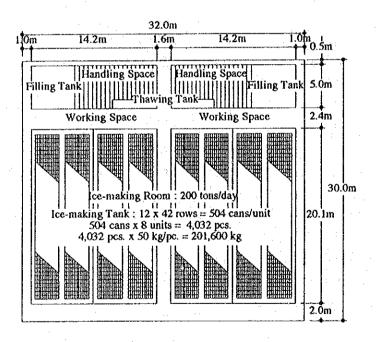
Ice-making Room Plan (Floor Area: 960 sq.m)
